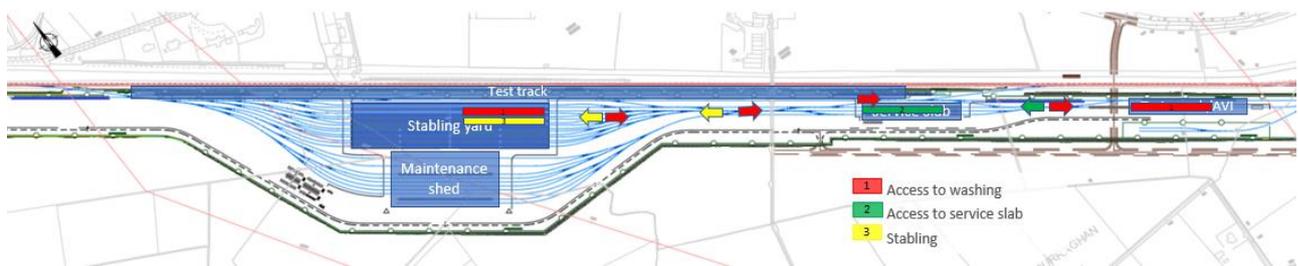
Movement 3: stabling → service/washing → stabling (Alternative 3)
